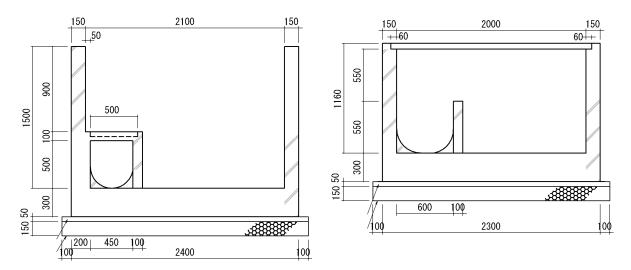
Interceptor Section for Japanese Bridge Canal
